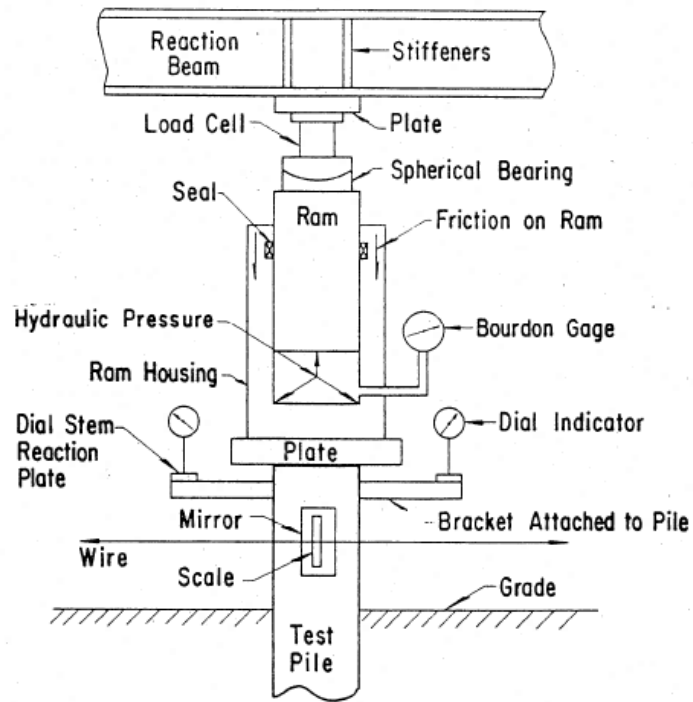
Schematic showing a typical axial compression pile load test setup.
